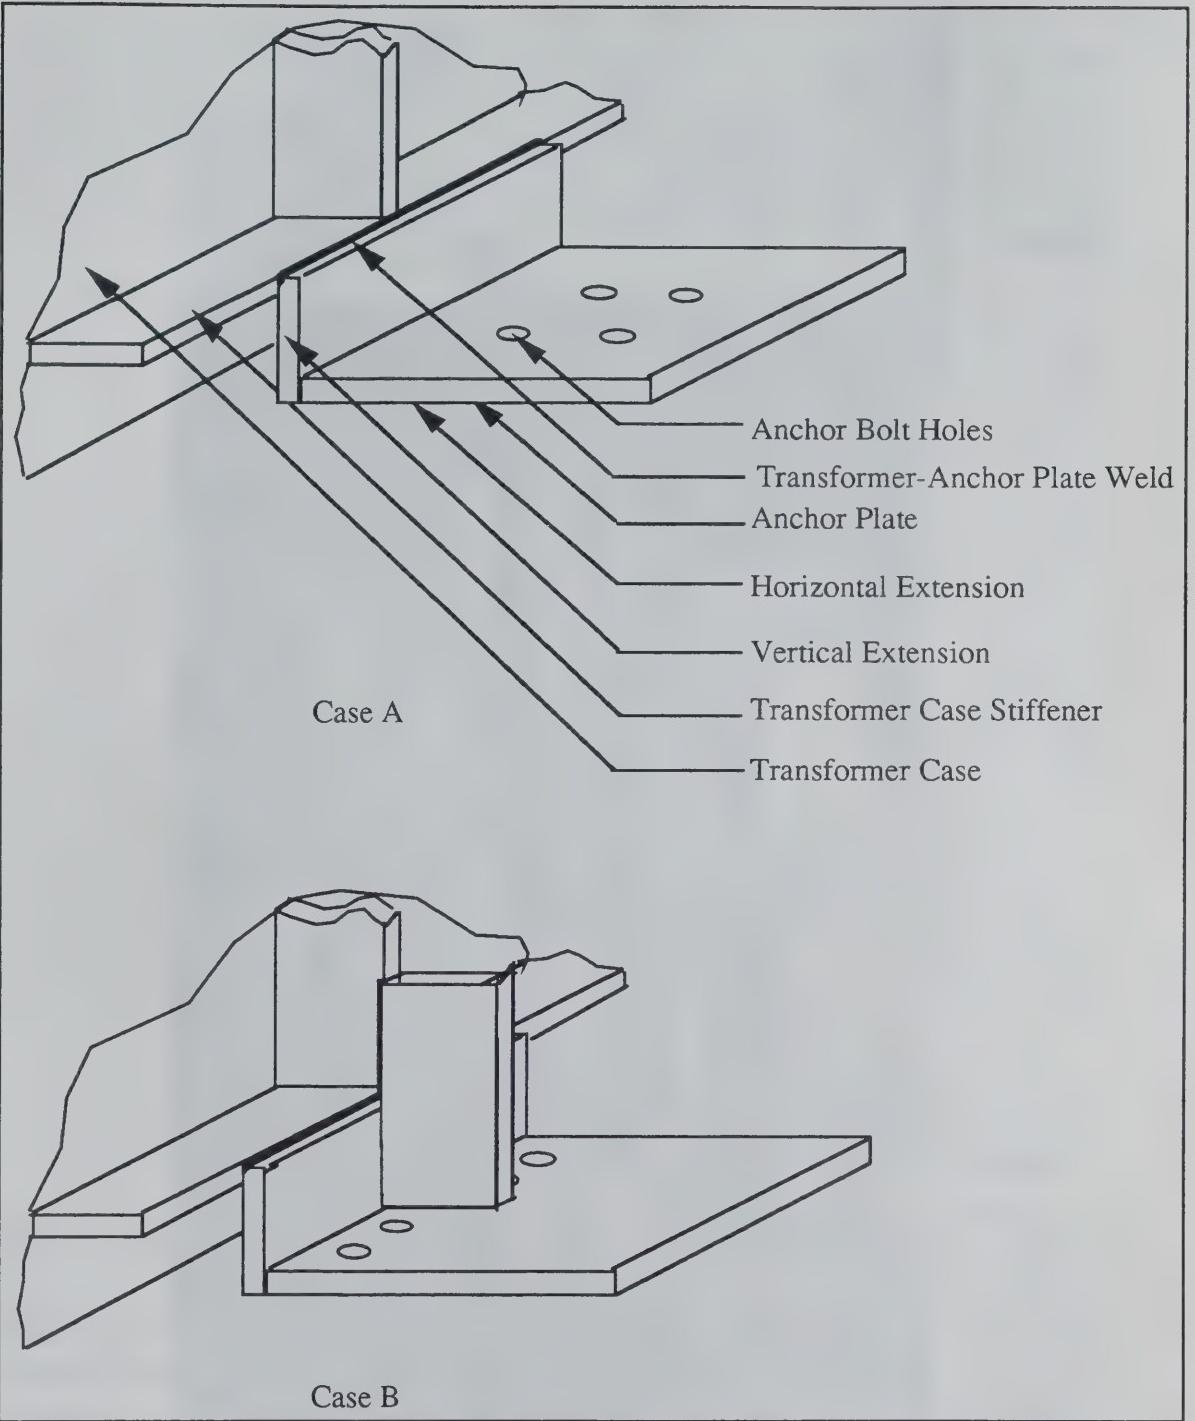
Schematic diagram of anchor plate designs to illustrate issues of stiffness, prying, and stress distribution along welds. Weld sizes should conform to requirements of AISC or AWS.
